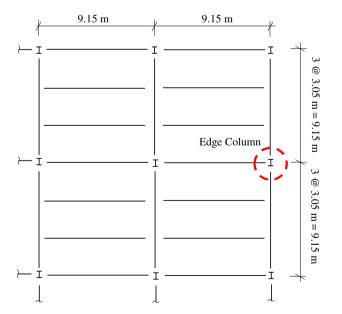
Plan view of the full-scale prototype steel gravity framing system used for calculating demands.
